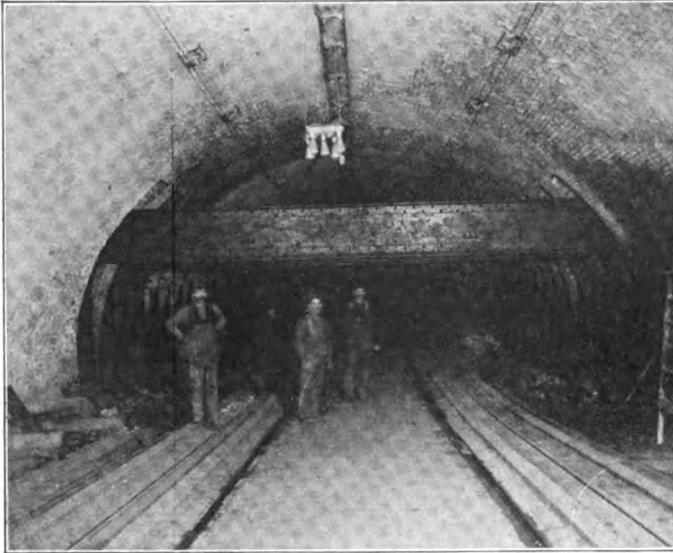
EAST END OF VAN BUREN STREET TUNNEL. of the Van Buren street tunnel in the July 13, 1906 issue of the Engineering World; and the plans for the above three tunnels in the June 20, 1906, issue of the Engineering World. In Engineering World May 15, 1906, a plan for lowering the tun-
